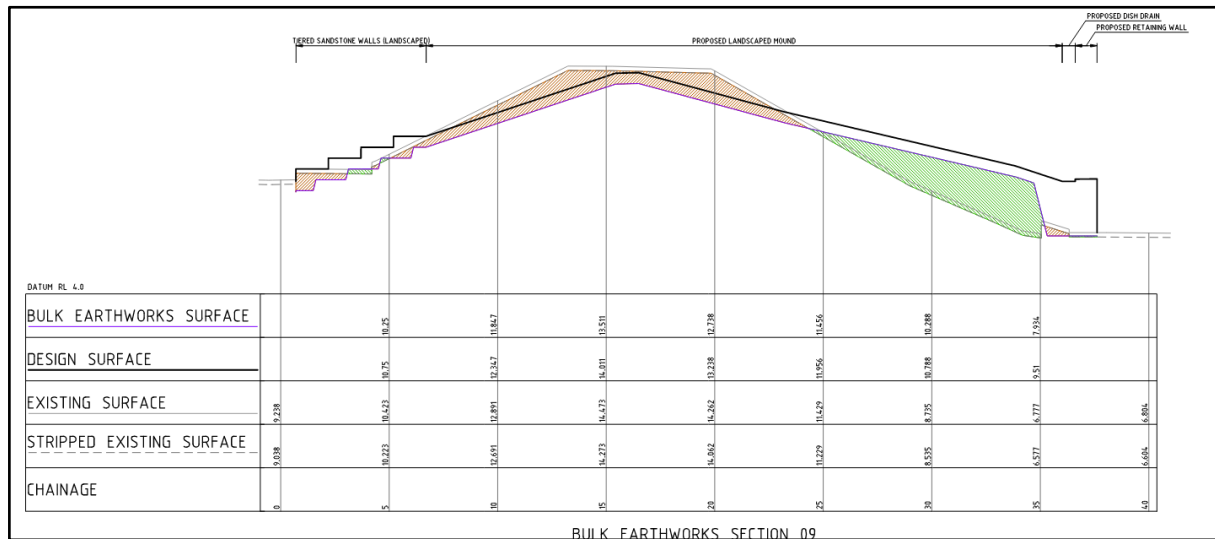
Slope Section of Section-09 Spans from North to South (NORTHROP, 2026)
